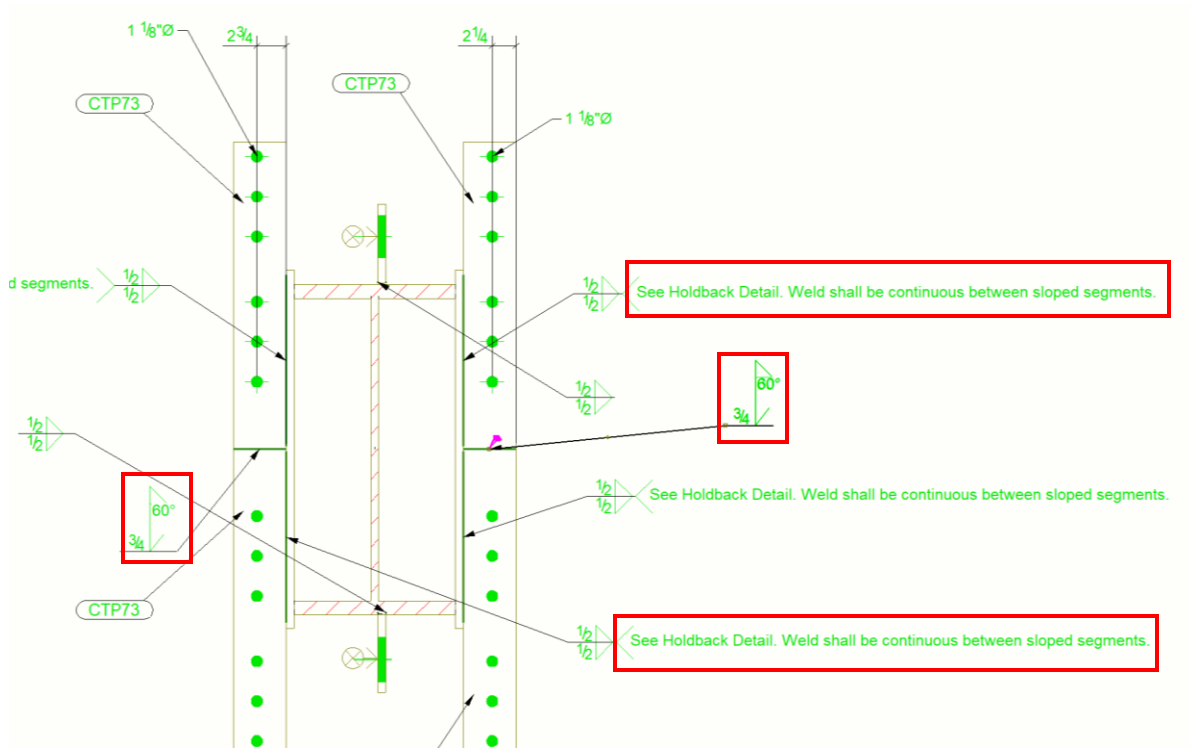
Weld 2 Note and CJP Callout in Drawings
